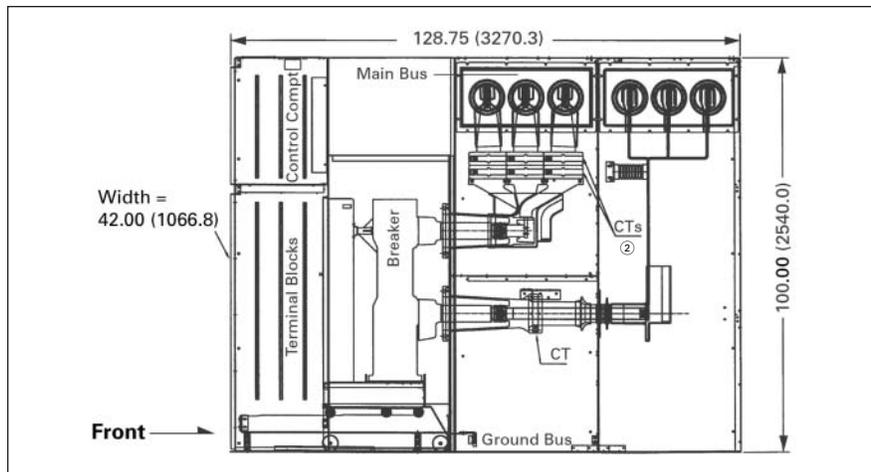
Indoor—Typical Breaker, Vertical Section, Bottom Cable Exit
